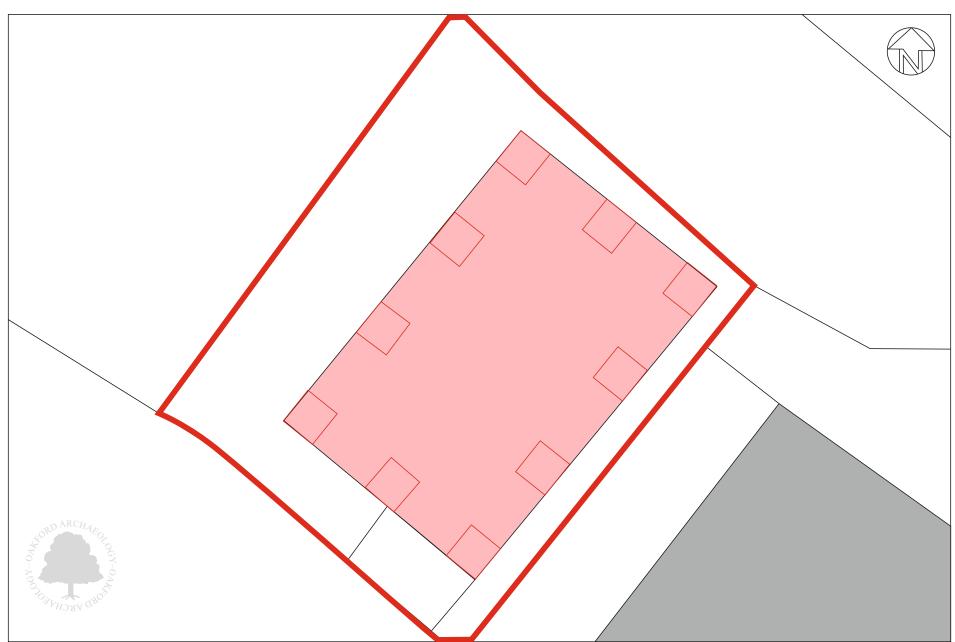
Plan showing the extent of initial ground reduction (pink) and foundation pads (red).
